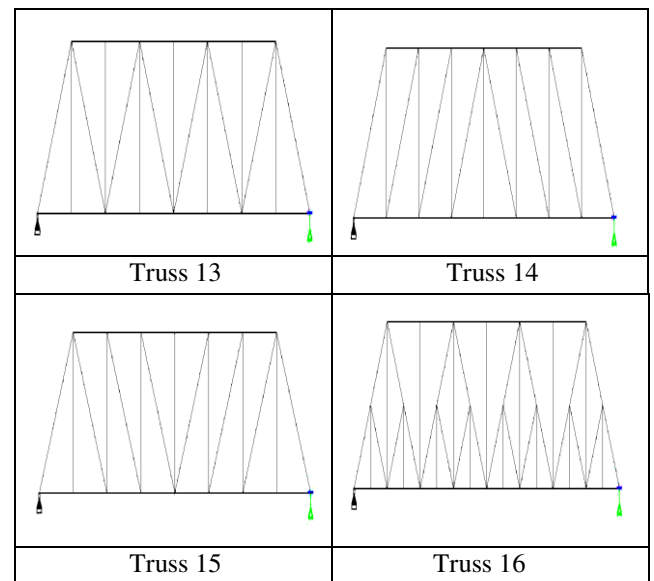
Trusses with slope and horizontal top chords [Truss 13 to Truss 16]
